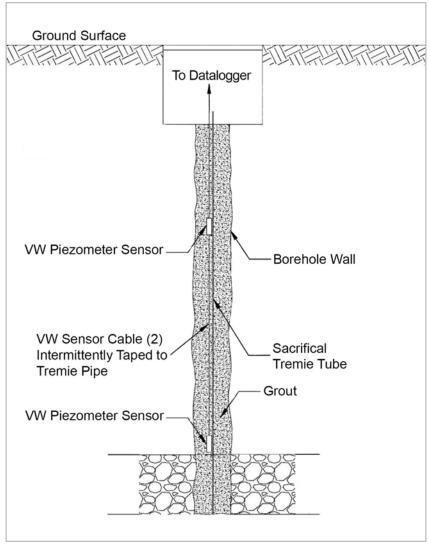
Multi-Level Fully Grouted Vibrating-Wire PZ Installation
